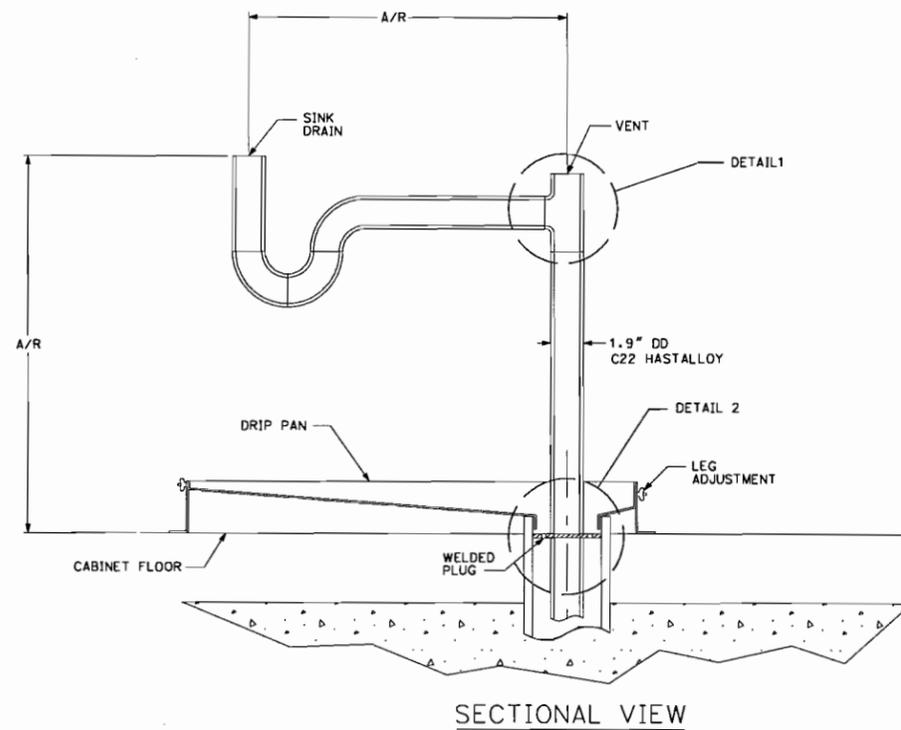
SECTION VIEW OF TYPICAL LABORATORY UNDER SINK AND FUME HOOD DRAIN FOR LAB BLDG SECONDARY CONTAINMENT LEAK COLLECTION PAN, INCLUDING LEAK TEST PLUG
